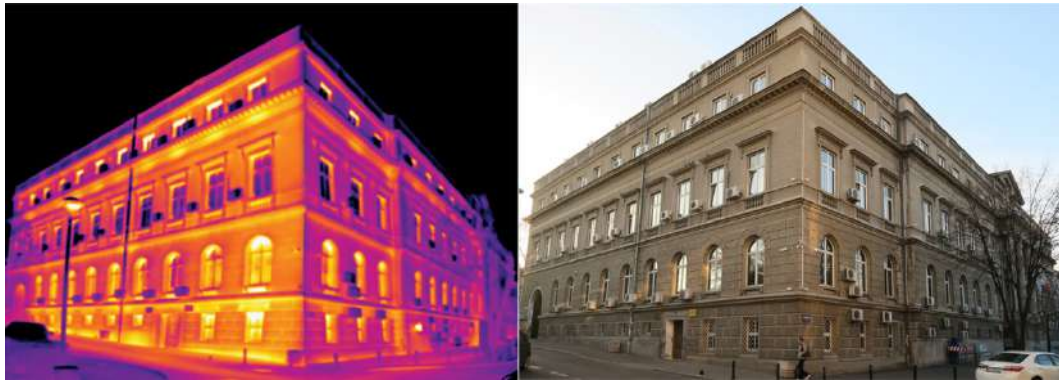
Thermal imaging and photograph of the street facade of the building of the City Municipality of Zemun. Heat losses are evident in the area where concrete beams are - over windows and in the area of window openings
